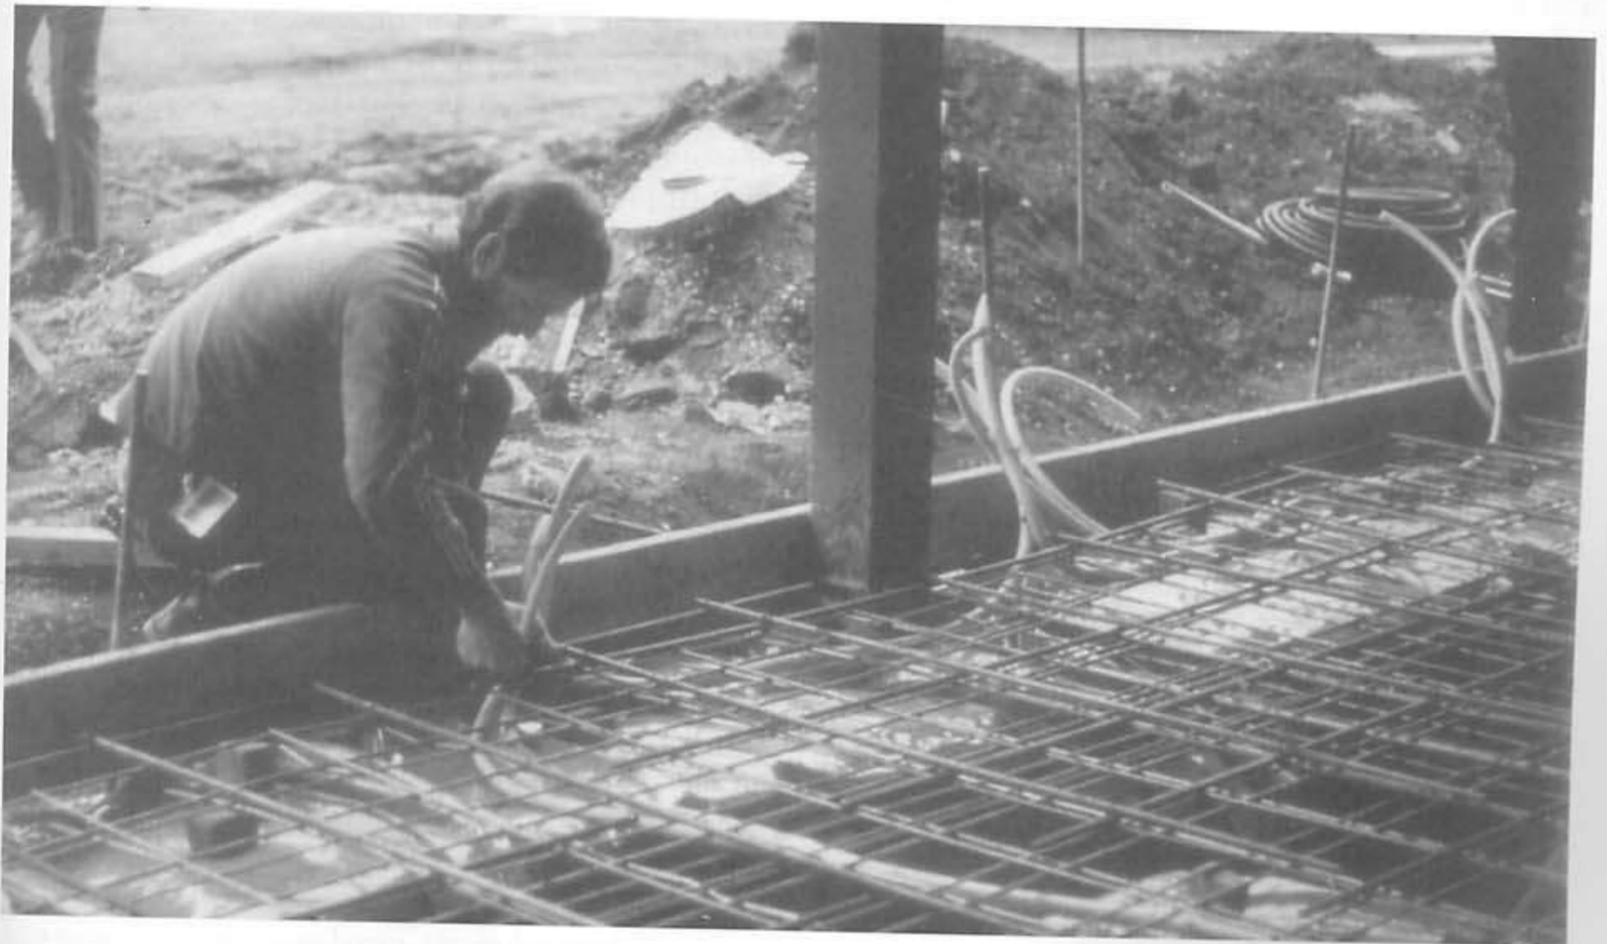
Installing corrugated PVC conduit in a concrete pour GERARD INDUSTRIES
